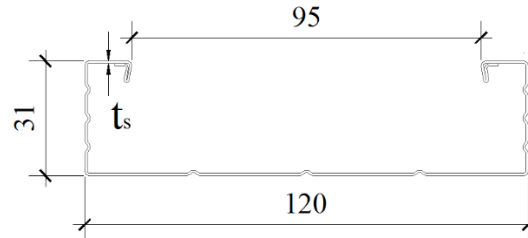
Cross-section geometry of the steel profile. Dimensions in millimeters.
